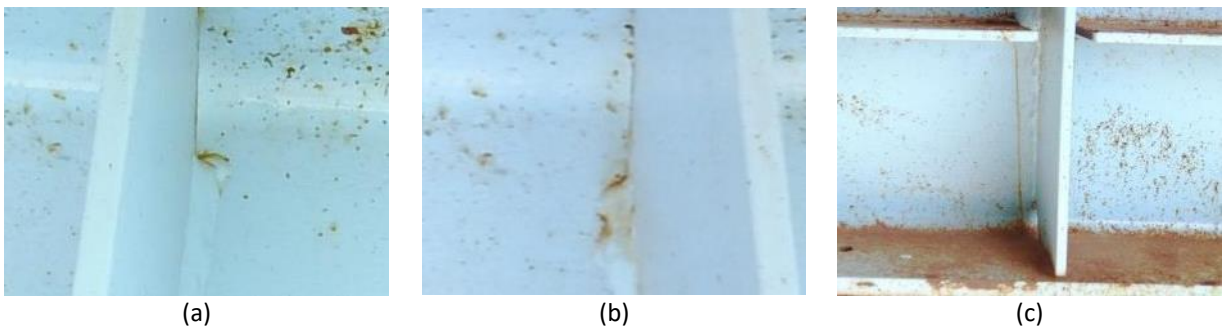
Inspection images taken by the DJI Mavic of a girder specimen: (a) top-right fatigue cracks, (b) top-left fatigue crack, and (c) scratch on bottom-left
